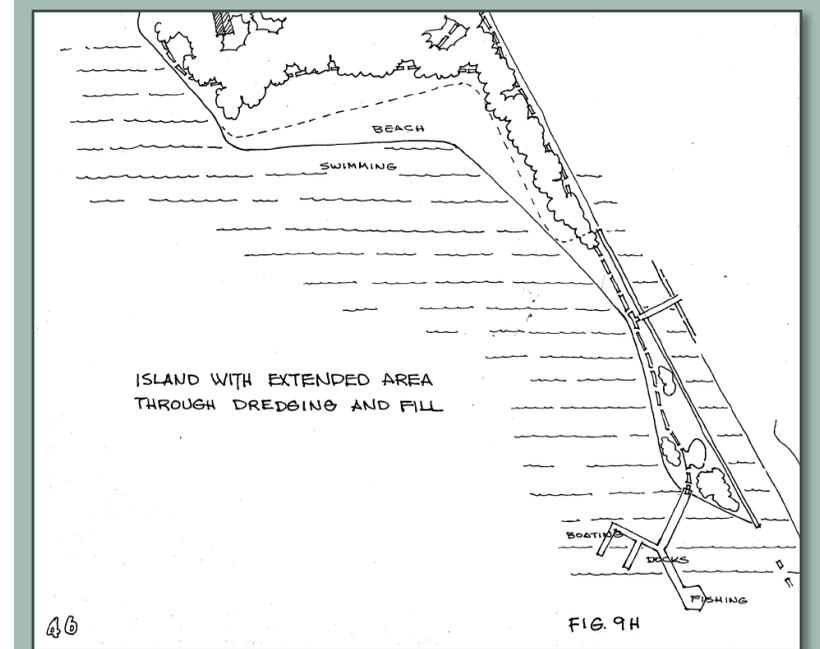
Beach and Seawall area plan from the 1975 Emerson Park Plan.
